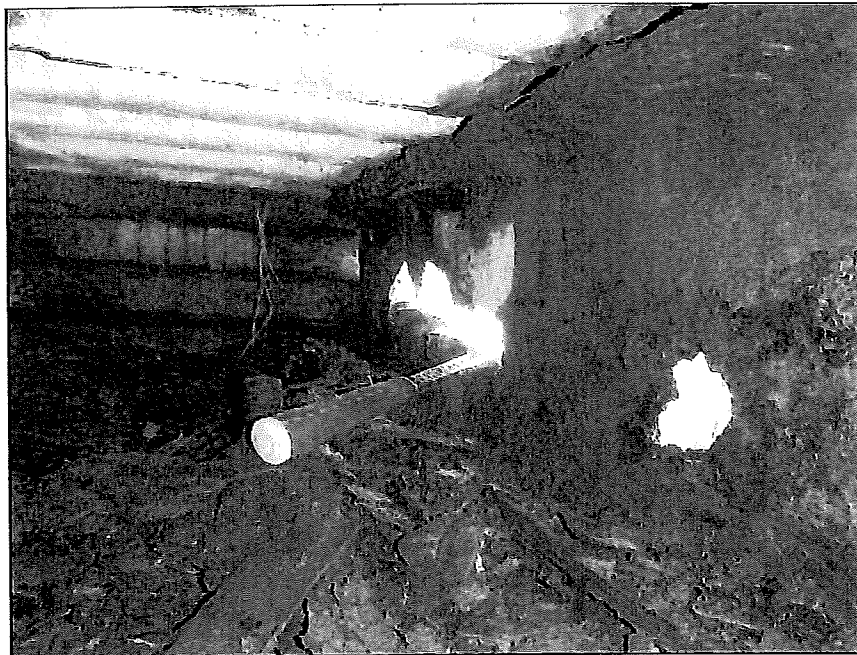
16" L x 4" H and 3" diam. Area of 100% Section Loss in Web of Beam 11 at East Abutment
